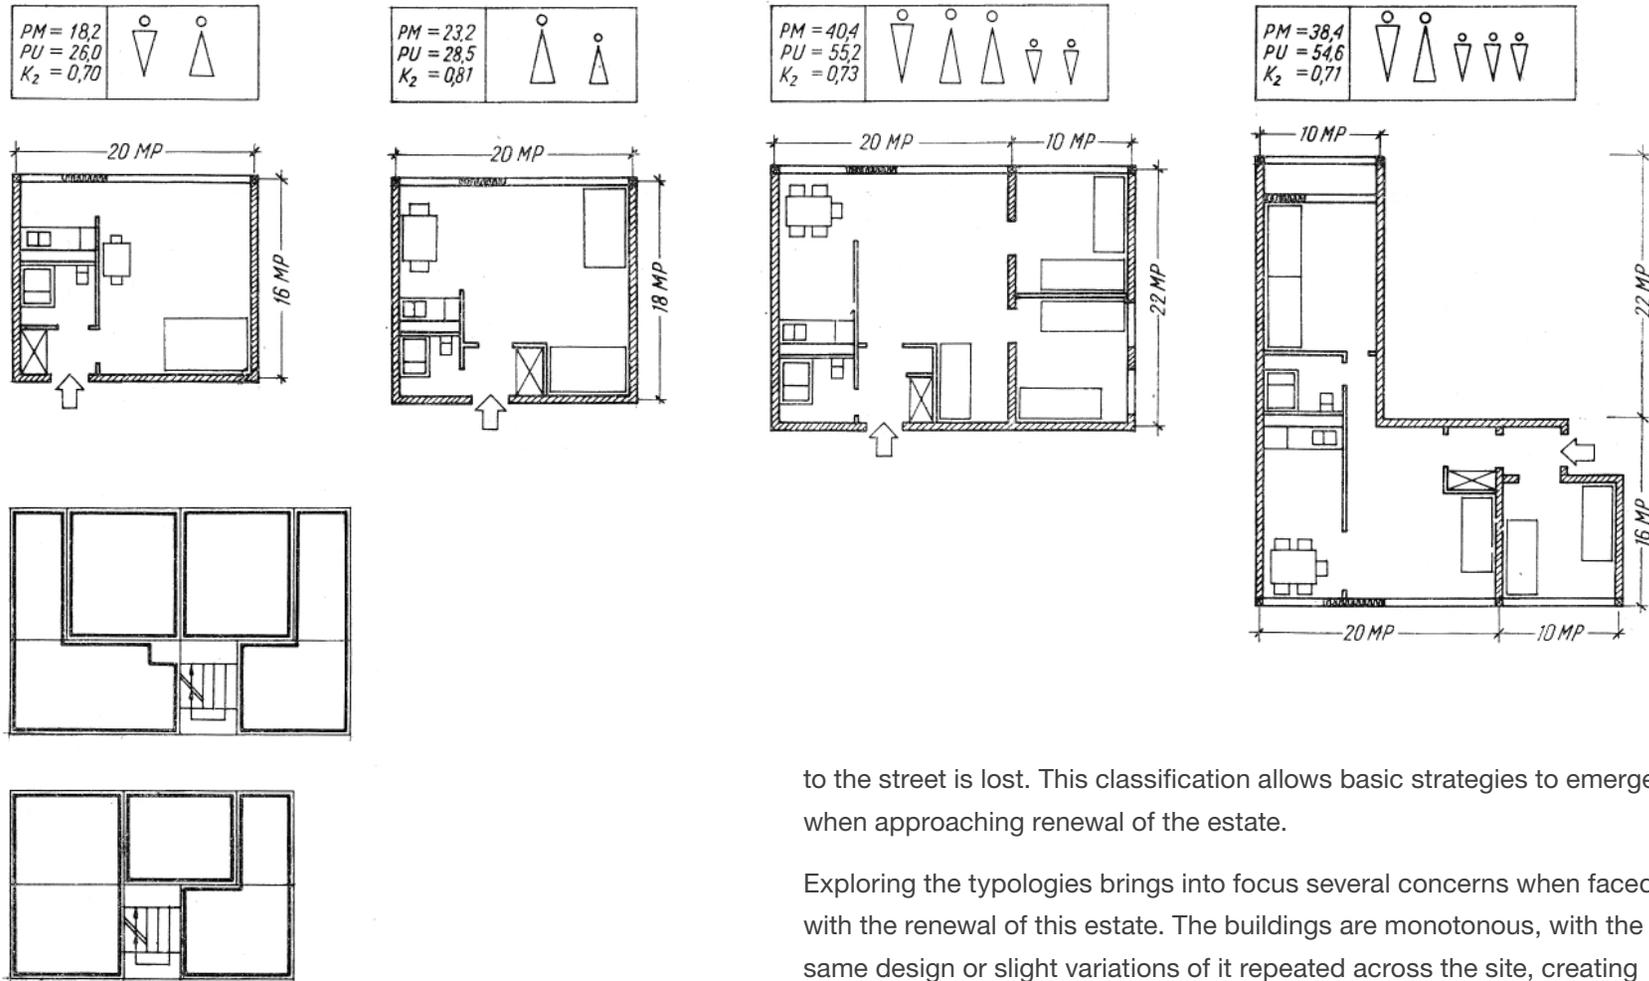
Sample pages from the catalogue of prefabricated housing estates. Showing typical plans of floors, and typical layouts for two-person units and family units.
